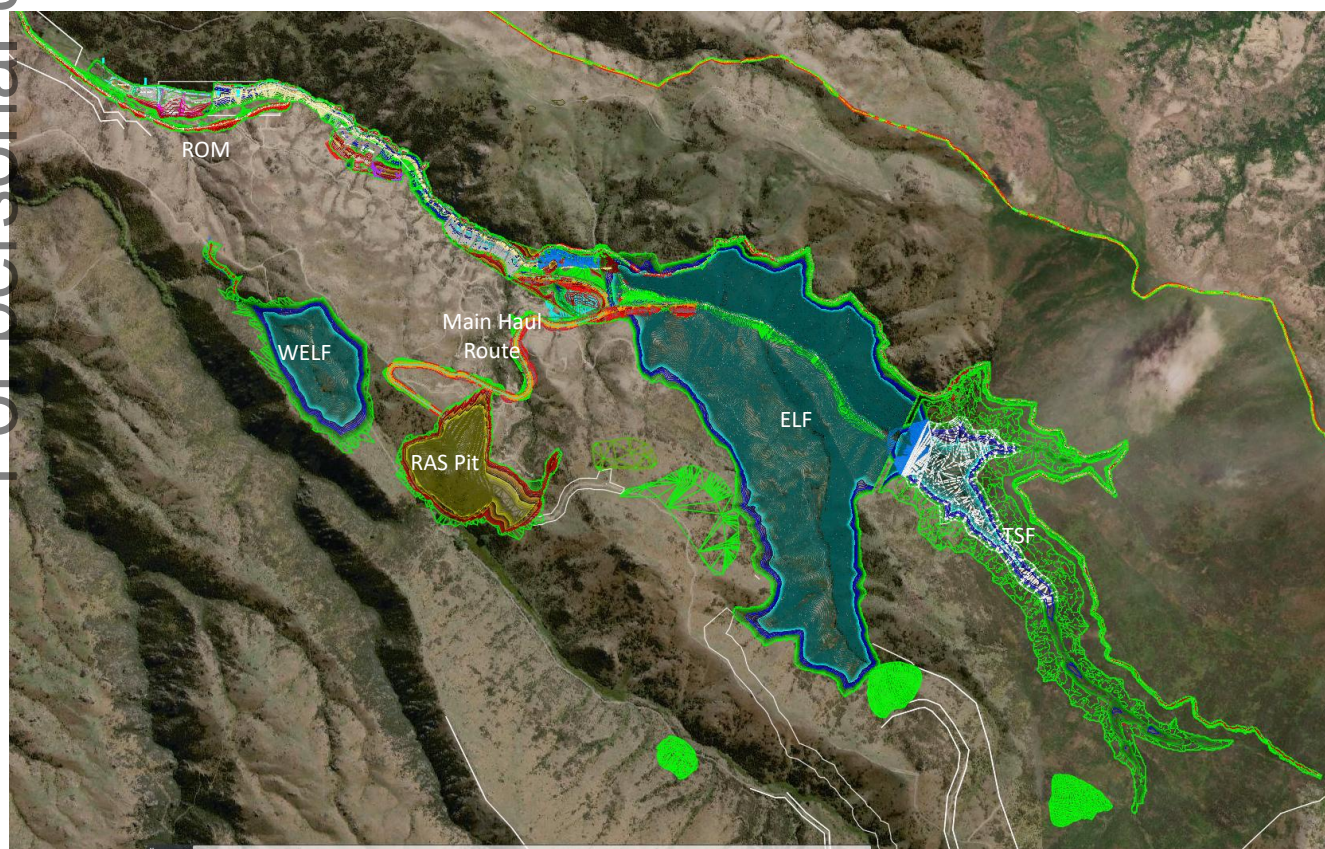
Plan View of RAS Starter Pit with Access to ELFs, TSF and ROM
